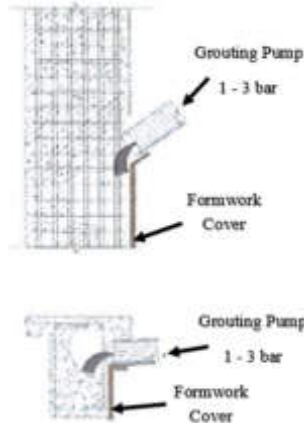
Honeycomb or Voids Concrete Damage Repair
